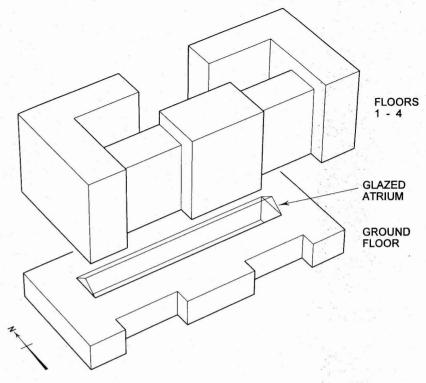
Sketch showing the plan-form of Watson's. (Jonathan Clarke).
